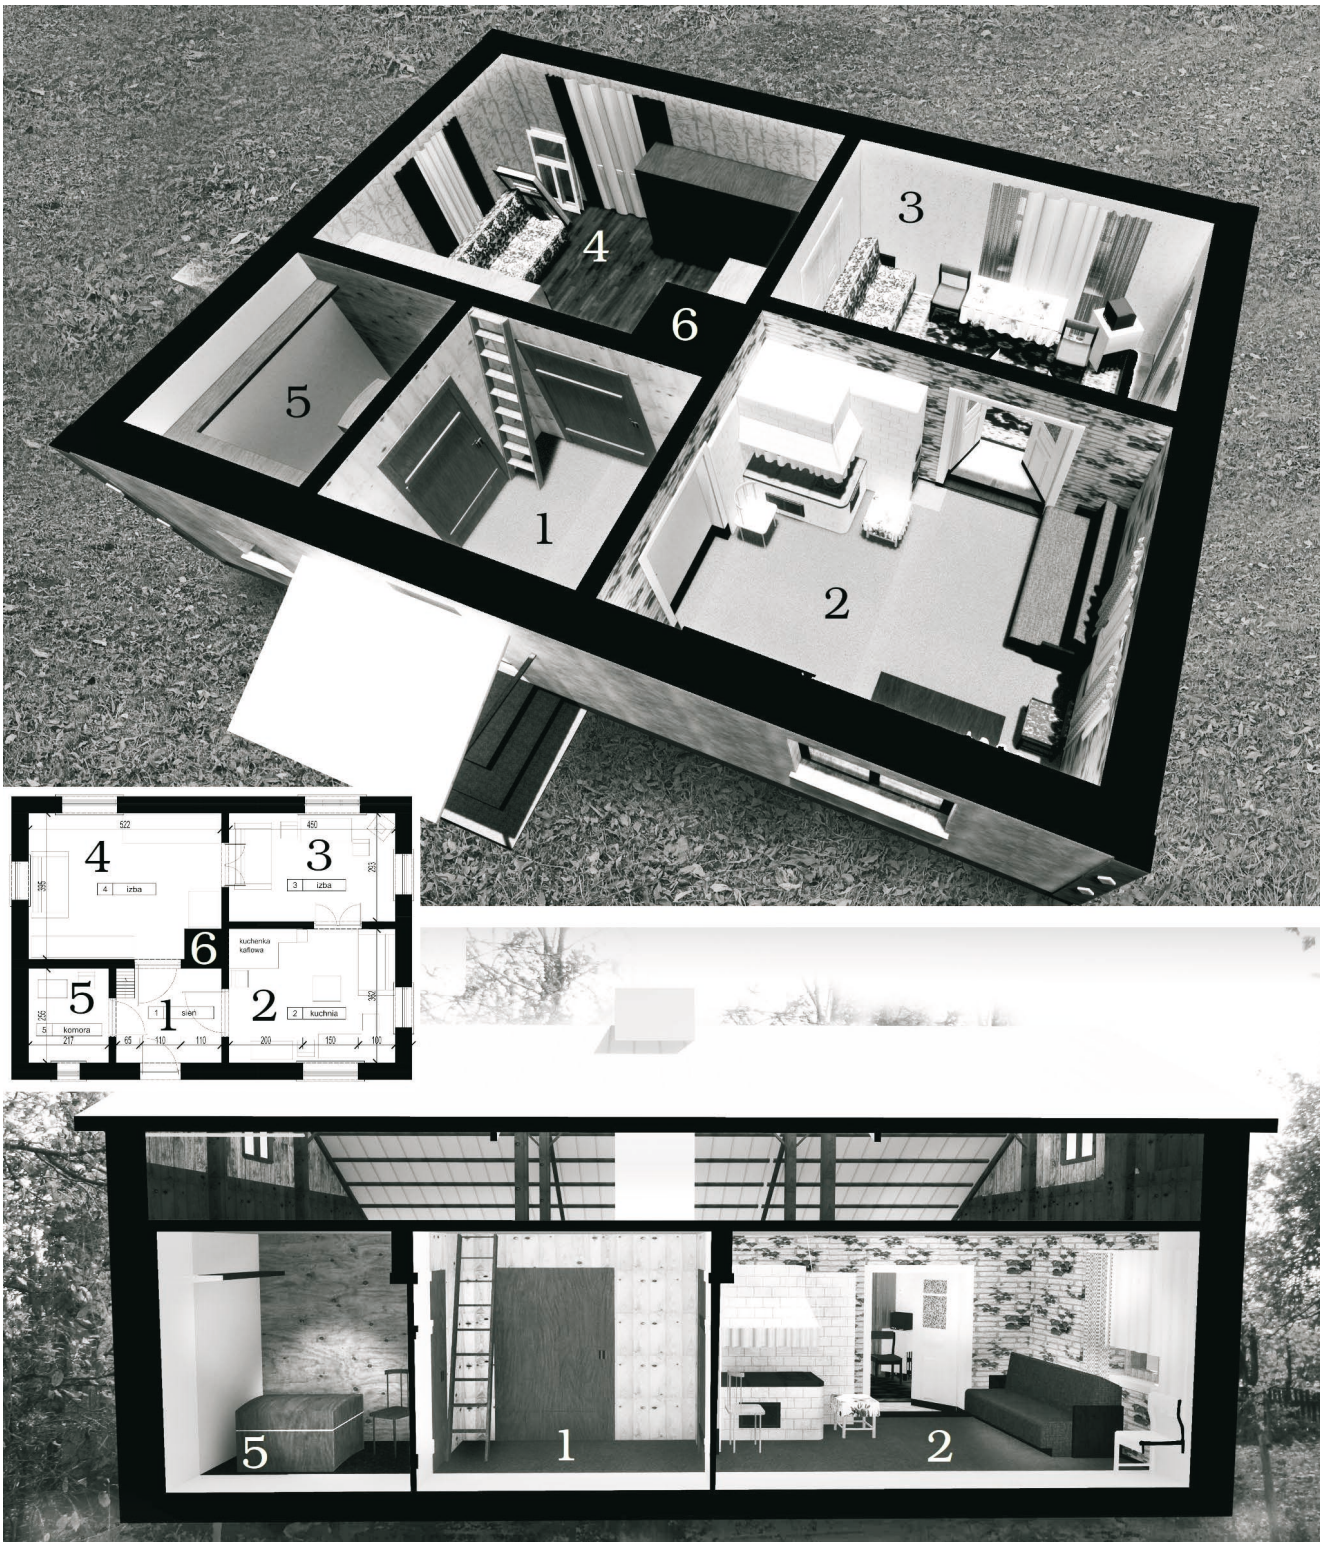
/a-c. House layout (plan and 3D schemes): 1 - hall, 2 - kitchen, 3 - sleeping room, 4 - living room, 5 - storeroom, 6 - stove and chimney; source: the authors, 2022
